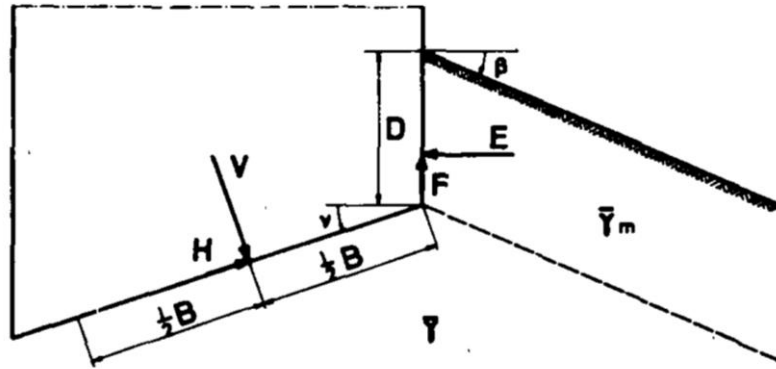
General case of retaining wall with ground and base inclination [10]
